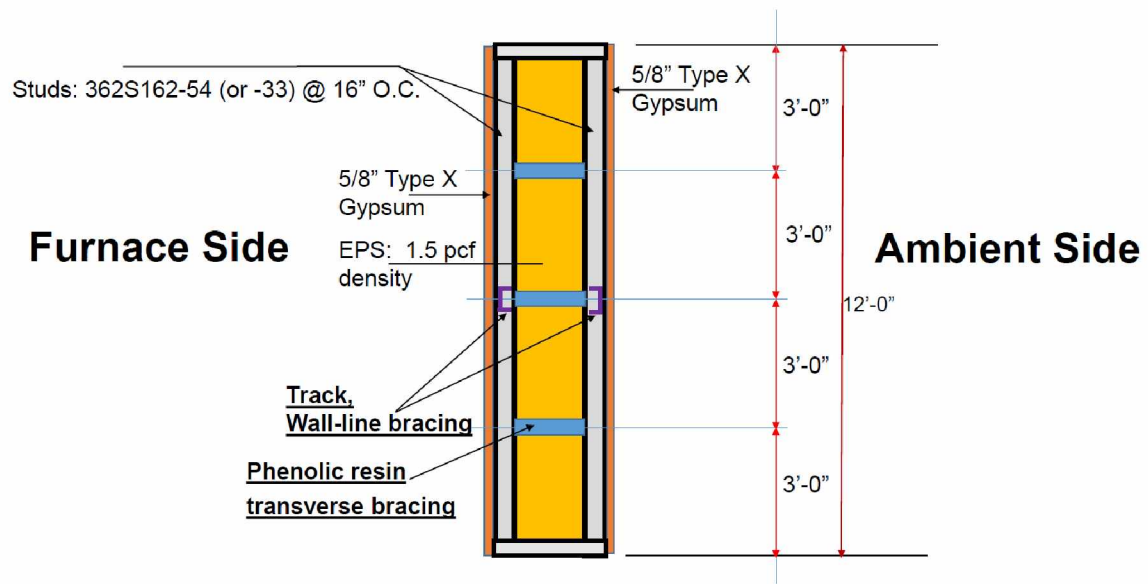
Elevation view of a single layer of gypsum board wall assembly with 3 ft O.C. transverse bracing
